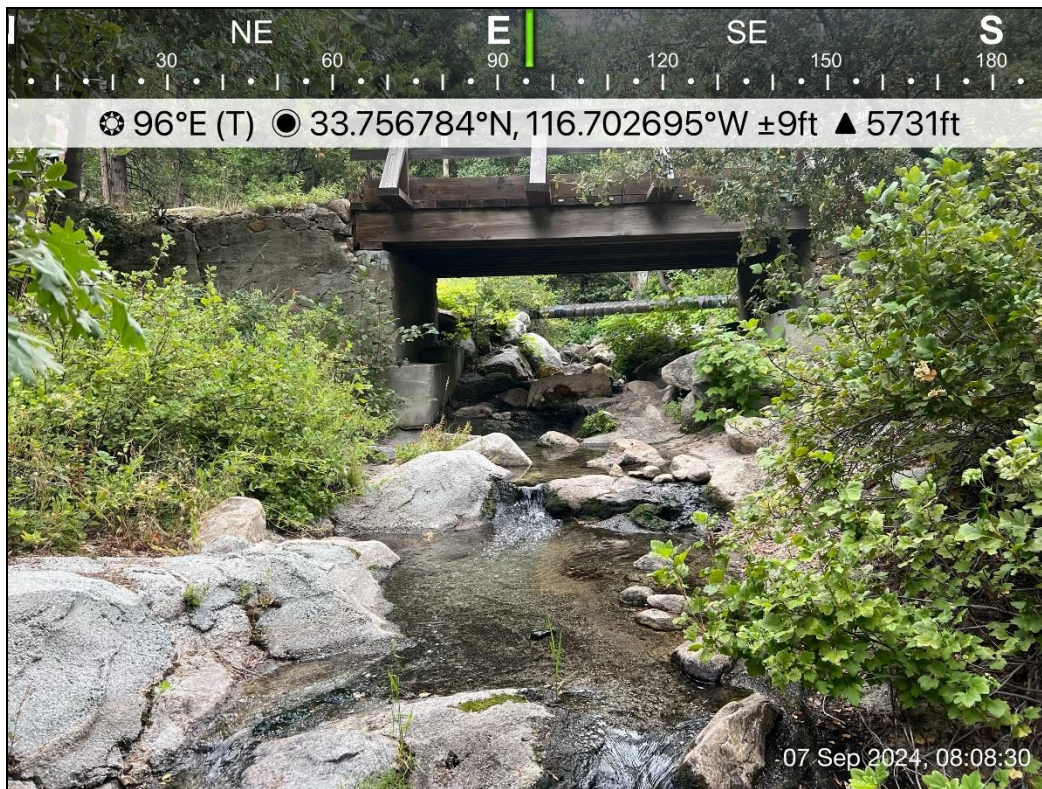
View within the creek showing the grouted bottom and very shallow pools.
